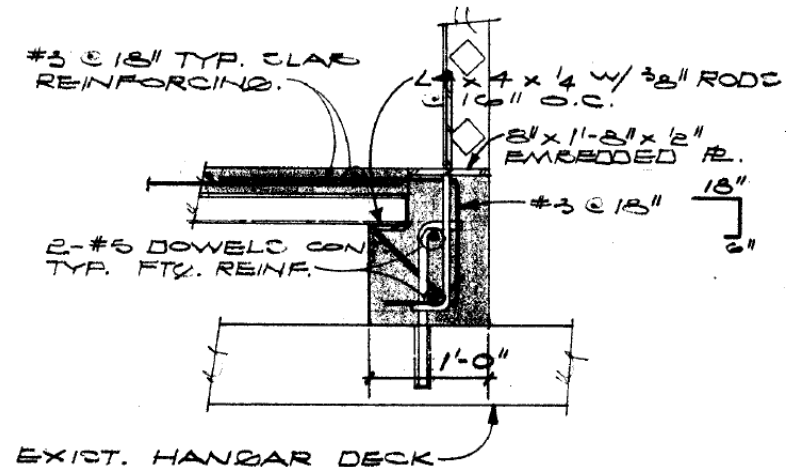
Example Interior Building Foundation: Reference Drawing M4-0001-S67
